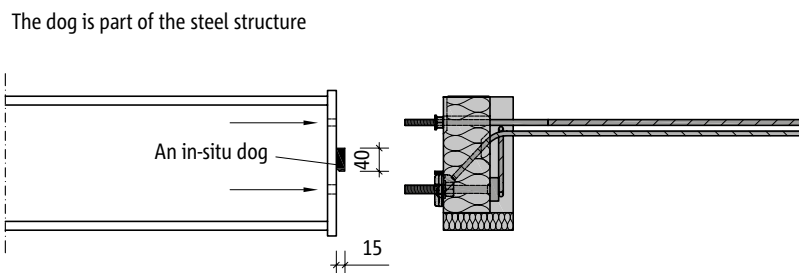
Installation of the steel beam on the Schöck Isokorb® renovation
